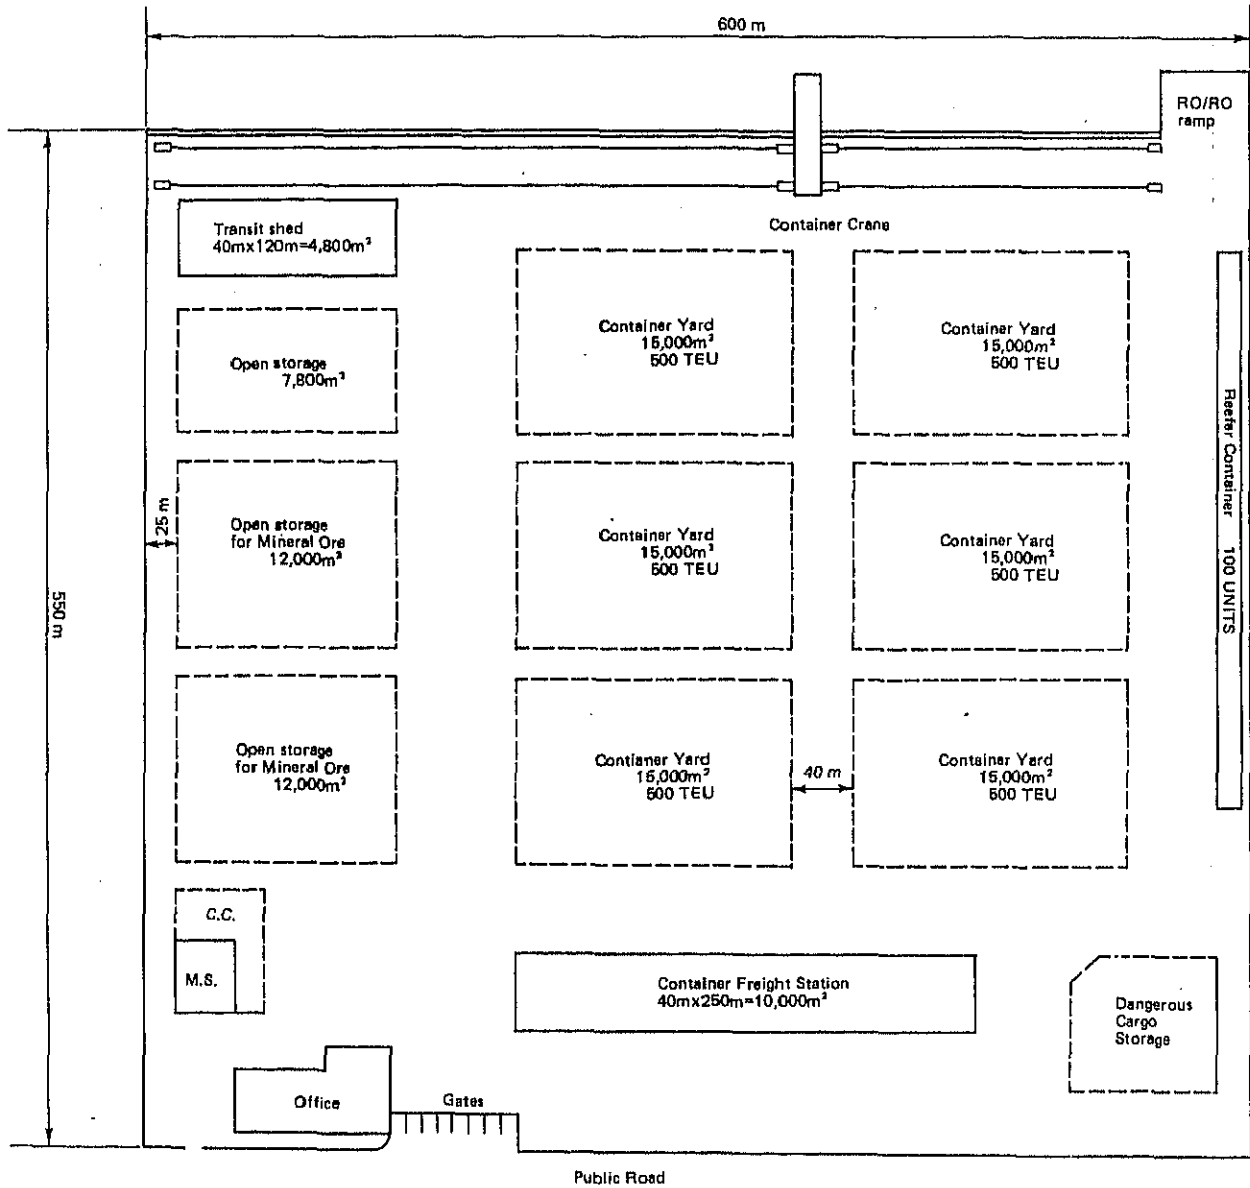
(b) An example of layout for Multi-Purpose Terminal (Chassis System)
